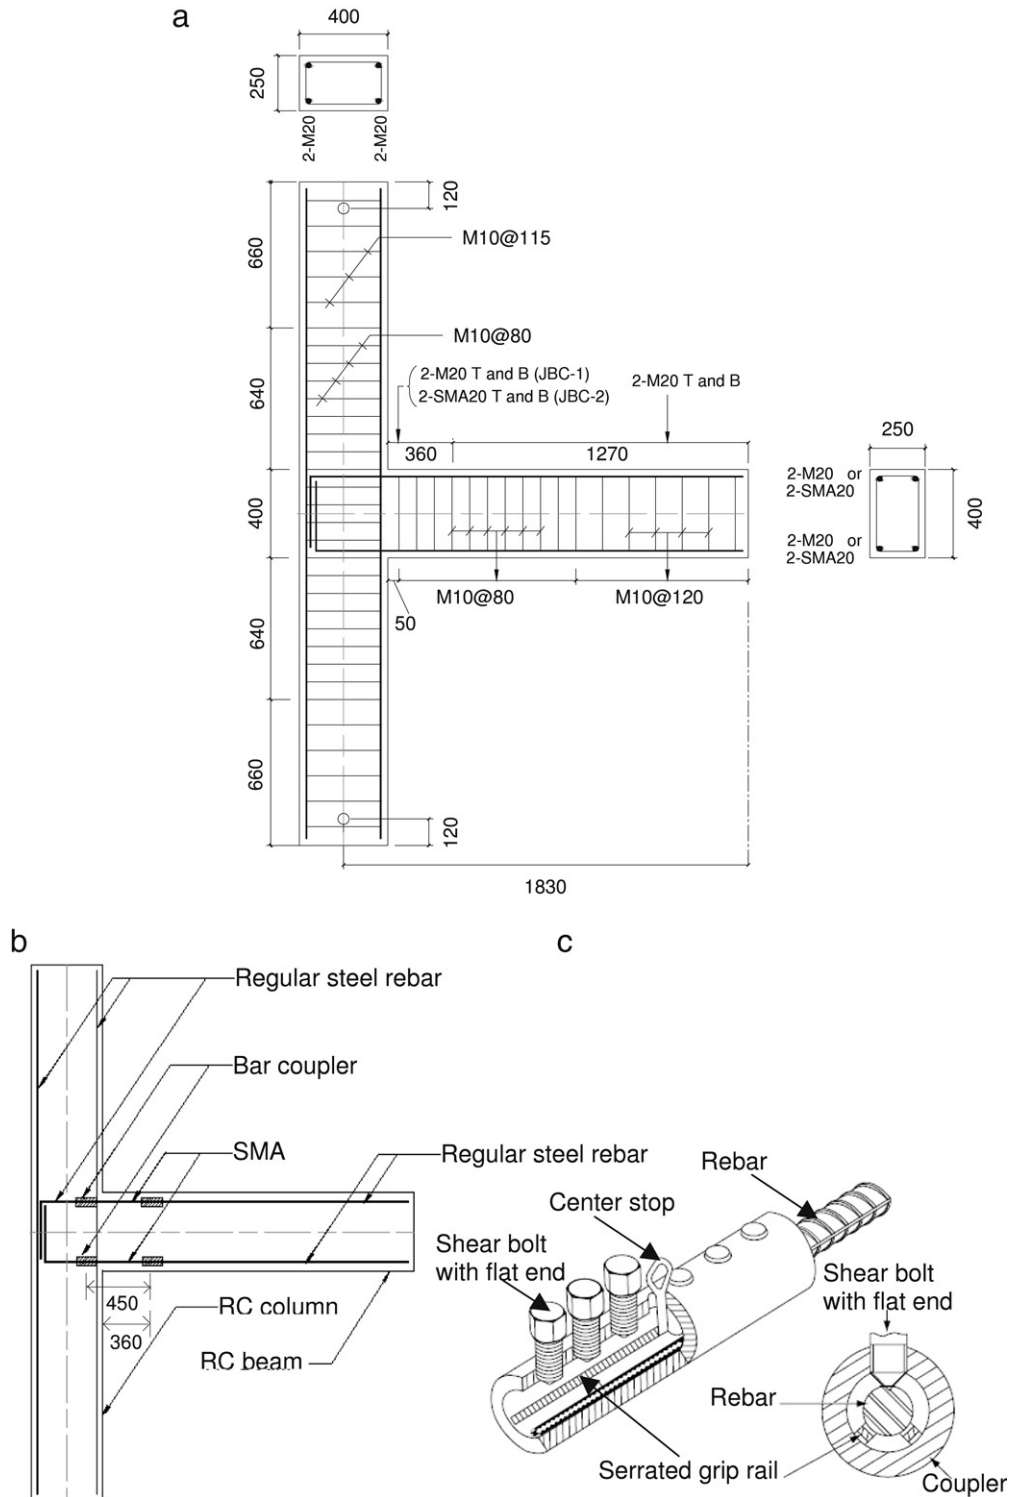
(a) Reinforcement details of specimens JBC-1 and JBC-2, (b) Splice details of specimen JBC-2, (c) single barrel screw-lock coupler for connecting SMA rebar with regular steel rebar (all dimensions in mm).
